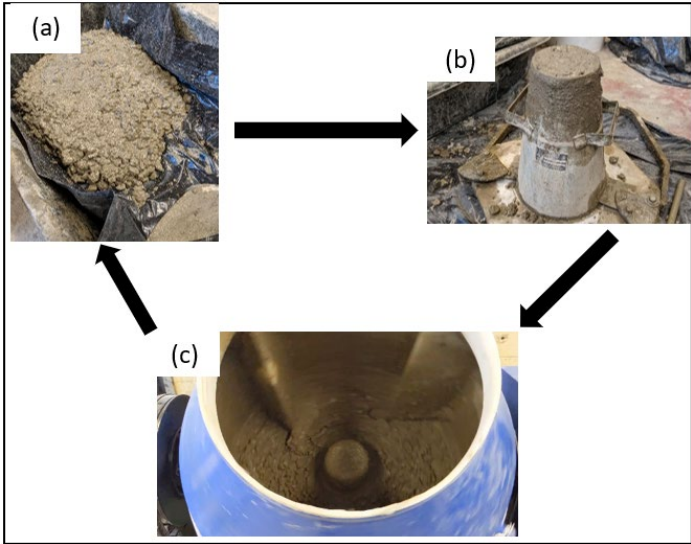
Photo. (a) Fresh concrete mix; (b) slump test setup; and (c) concrete kept in a mixing drum at 25 rpm to provide mild agitation and prevent stiffening.
